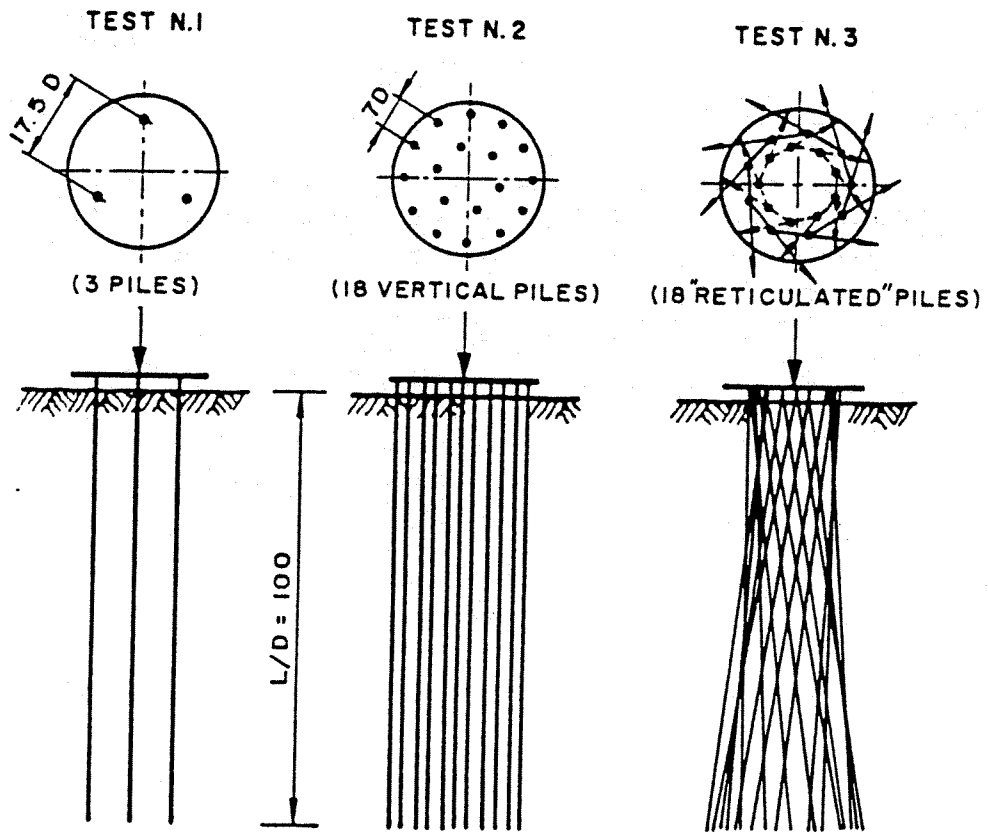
Arrangement of Piles in Lizzi's Original Model Tests
